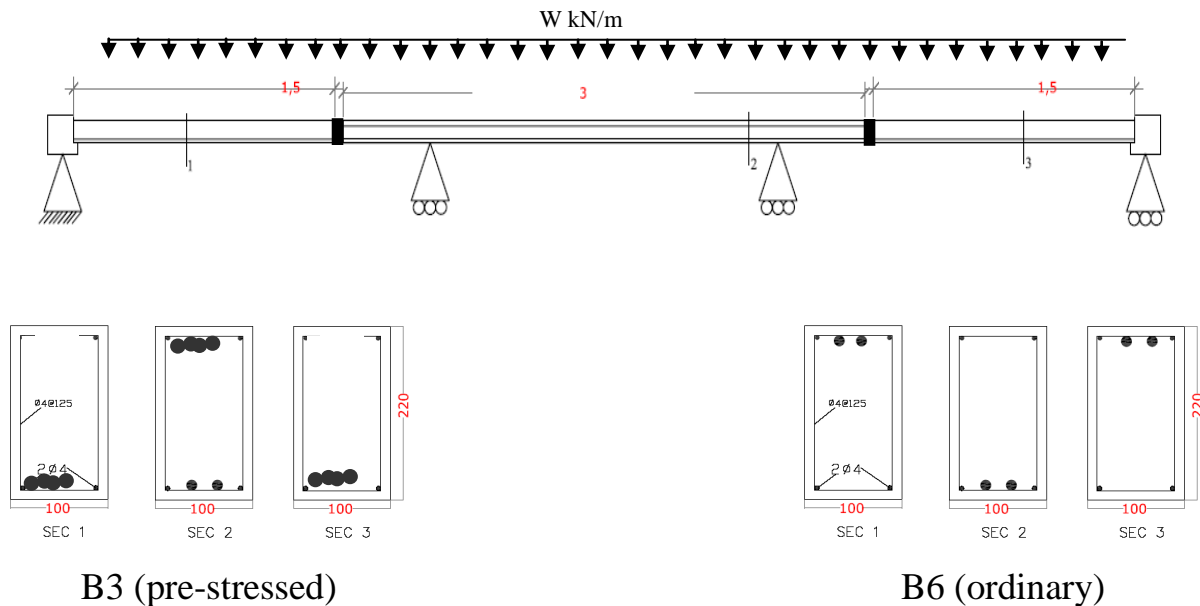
Dimensions and reinforcement details of Girders (B3 and B6).
